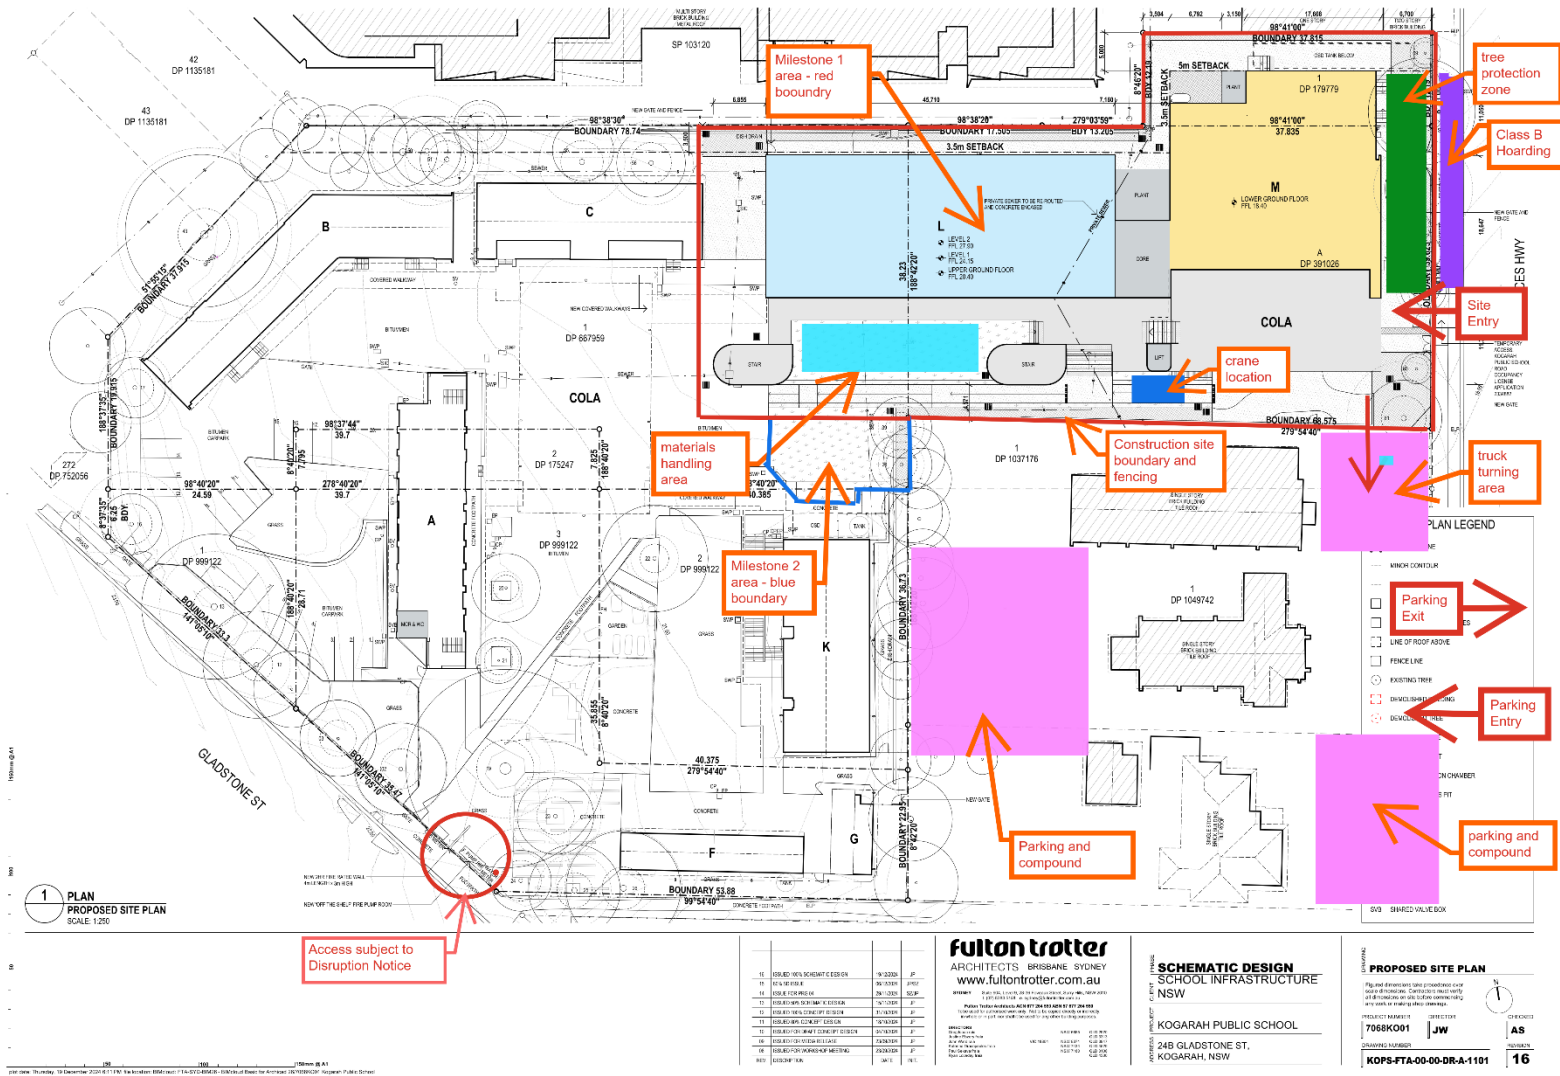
Proposed Construction Site Establishment Plan - Church Site Option
